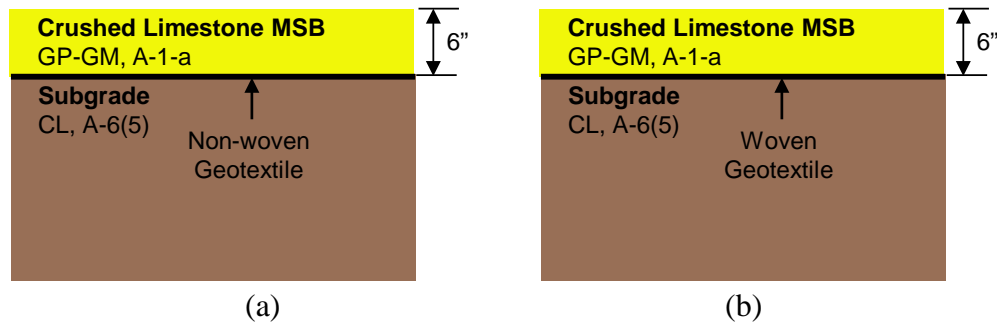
Pavement foundation profiles with (a) non-woven geotextile on 4th St. North, and (b) woven geotextile on 4th St. South
